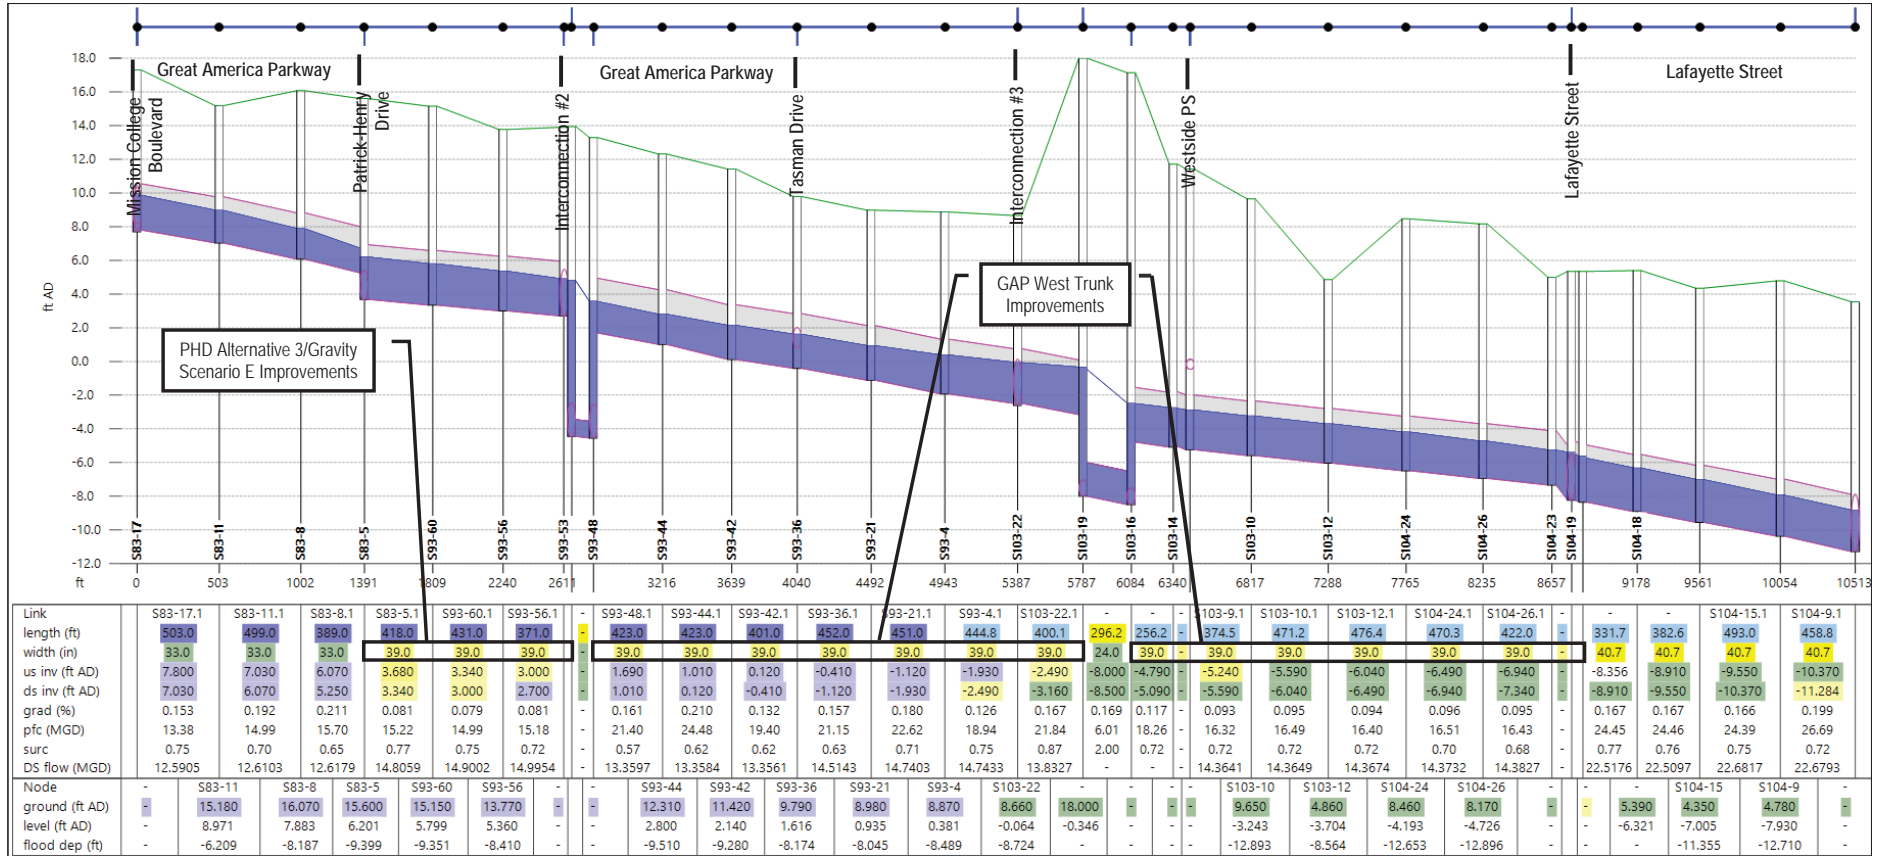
Great America Parkway East Trunk Improvements Profile (Future 2035 PWWF assuming Alternative 1 is constructed)
